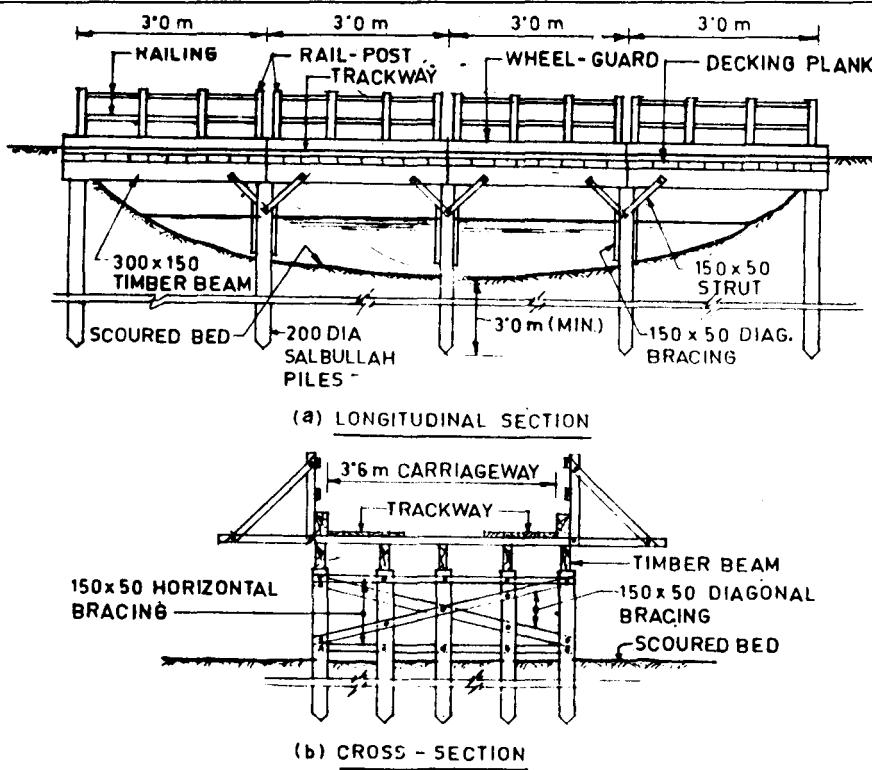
TIMBER BRIDGE WITH TIMBER BEAMS
